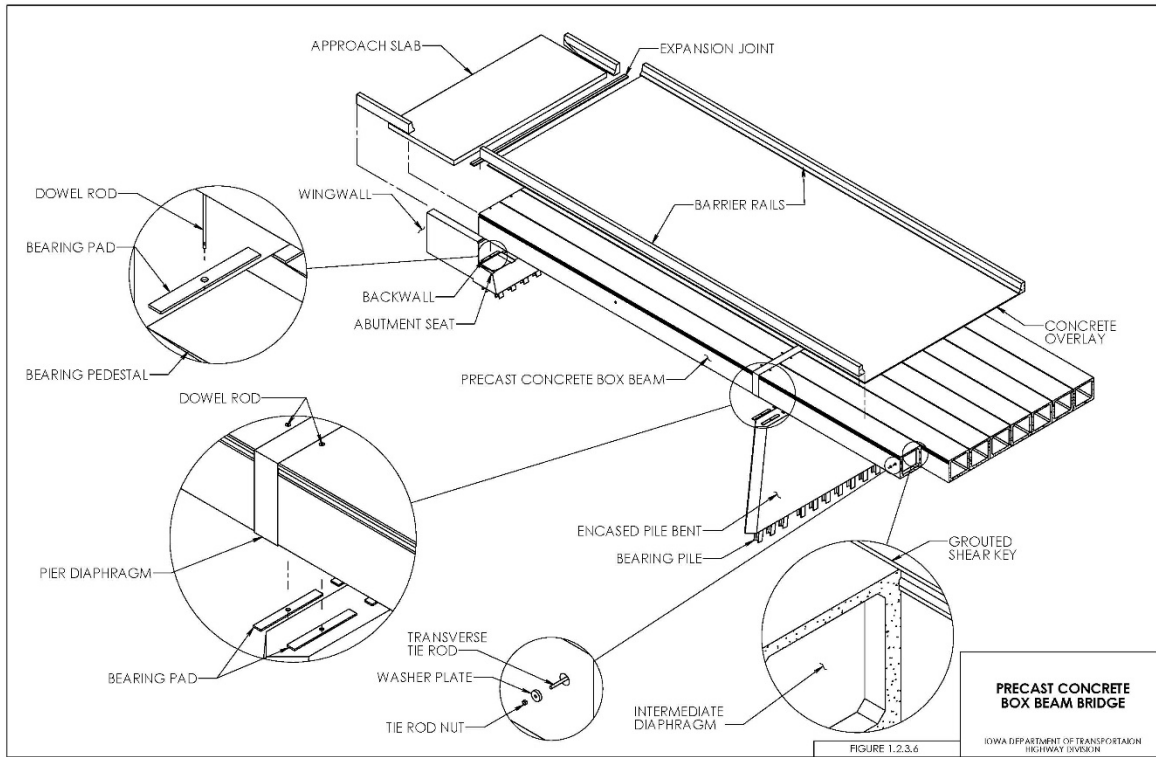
Precast Concrete Box Beam Bridge Components
